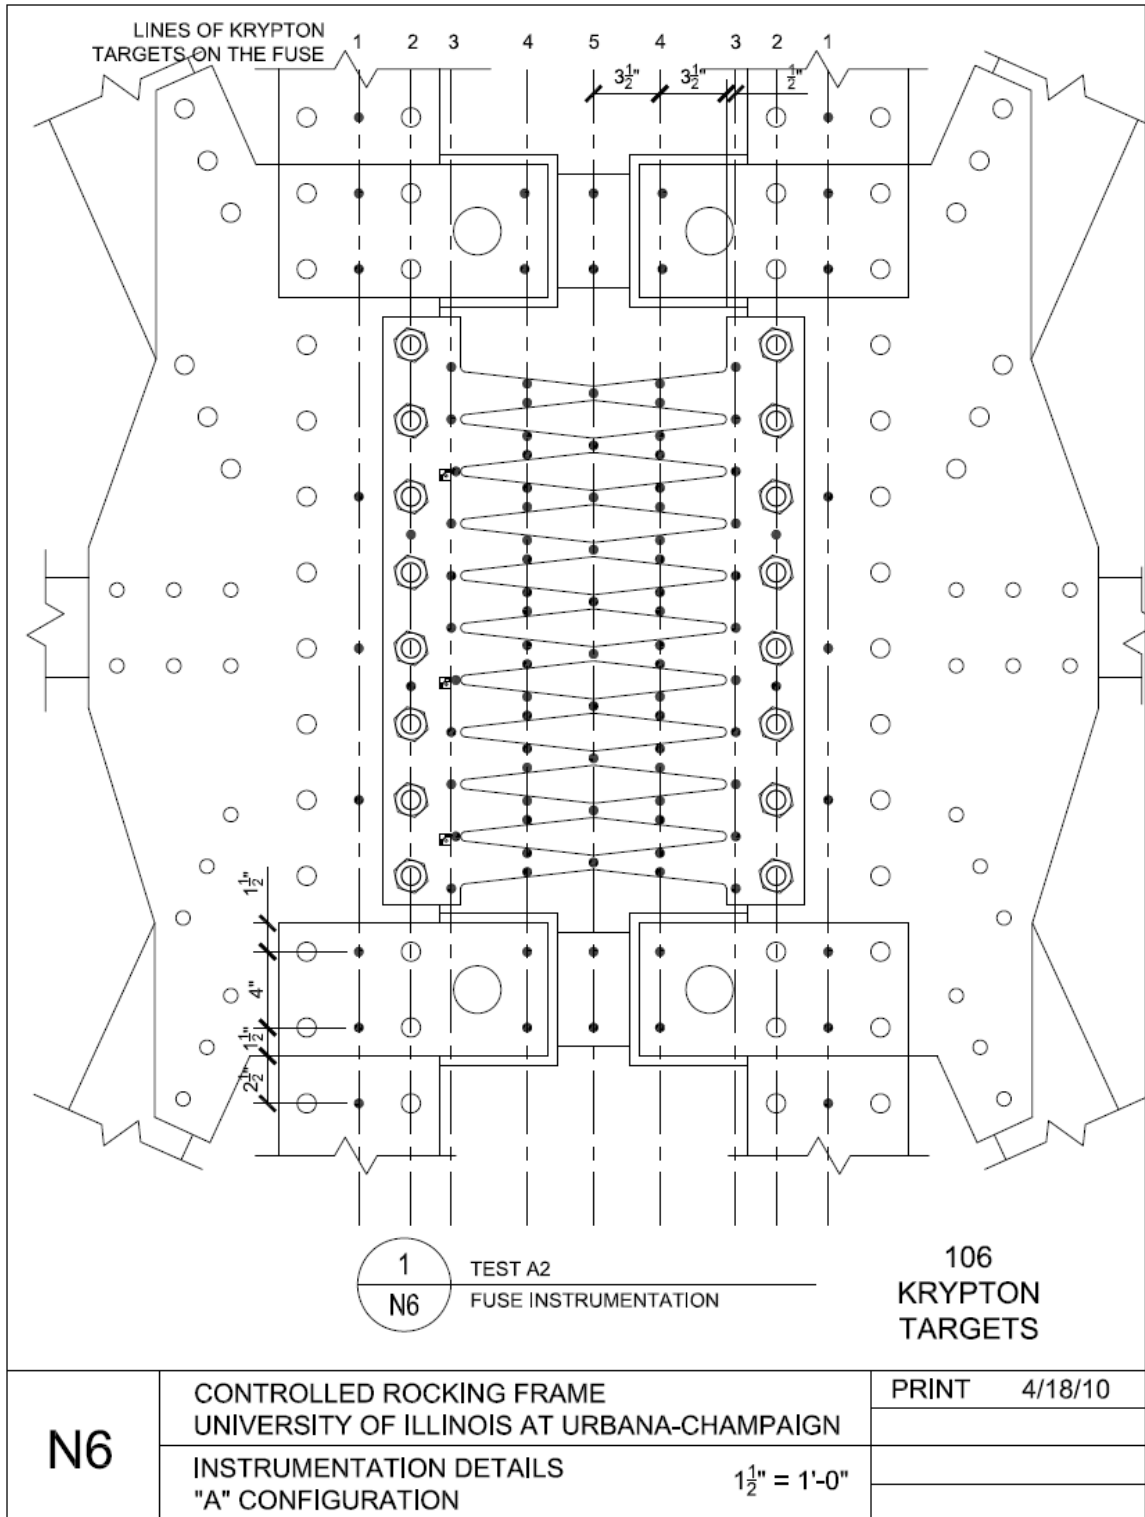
Instrumentation Plan Drawing – Krypton LED’s for Specimen A2
